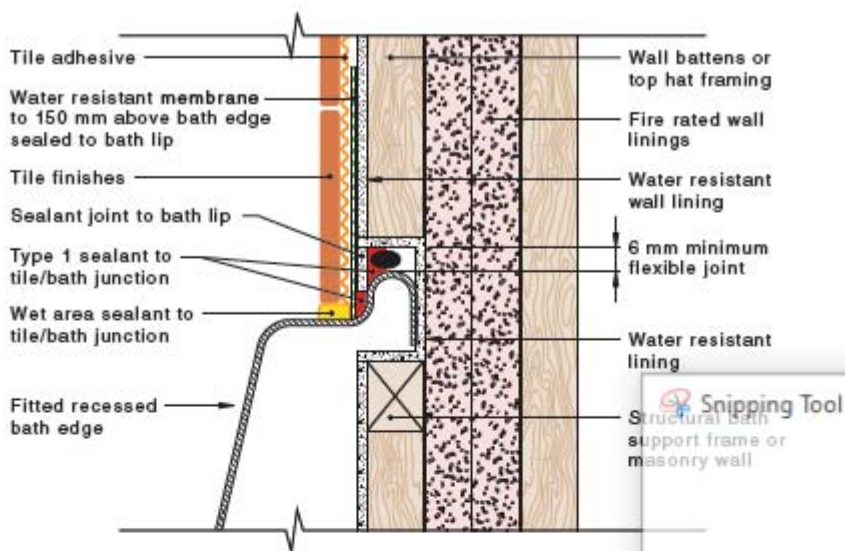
(E) — Bath with no shower over it — Fitted bath — Fire rated framed wall
